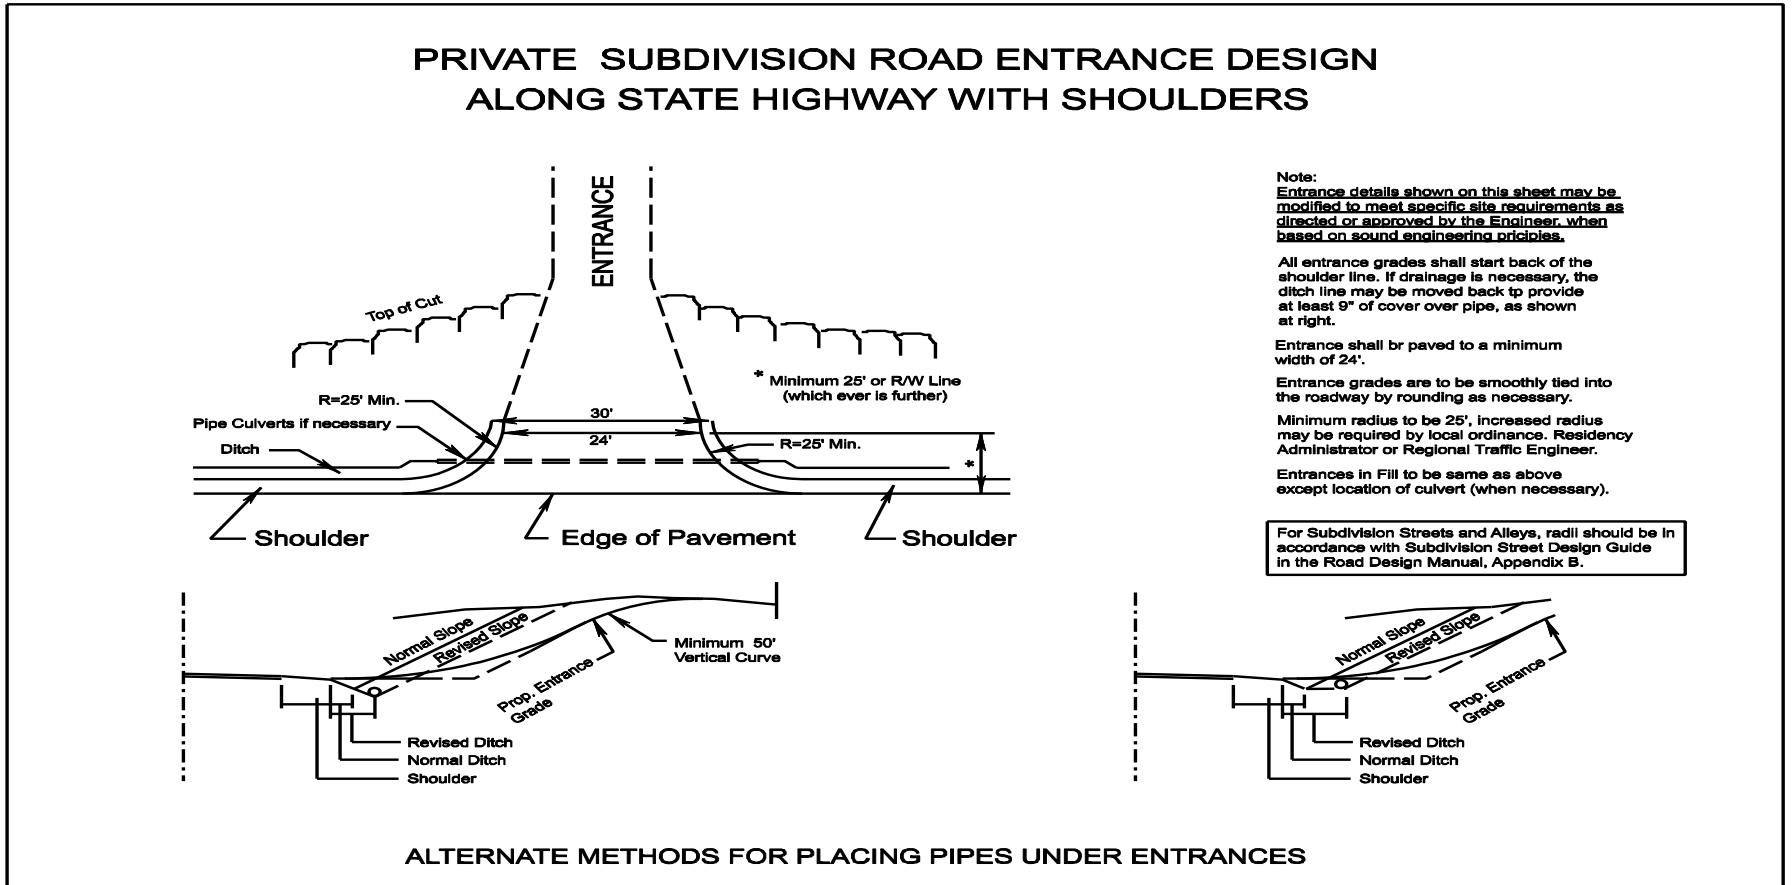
8 STANDARD PRIVATE SUBDIVISION ROAD / STREET ENTRANCE
